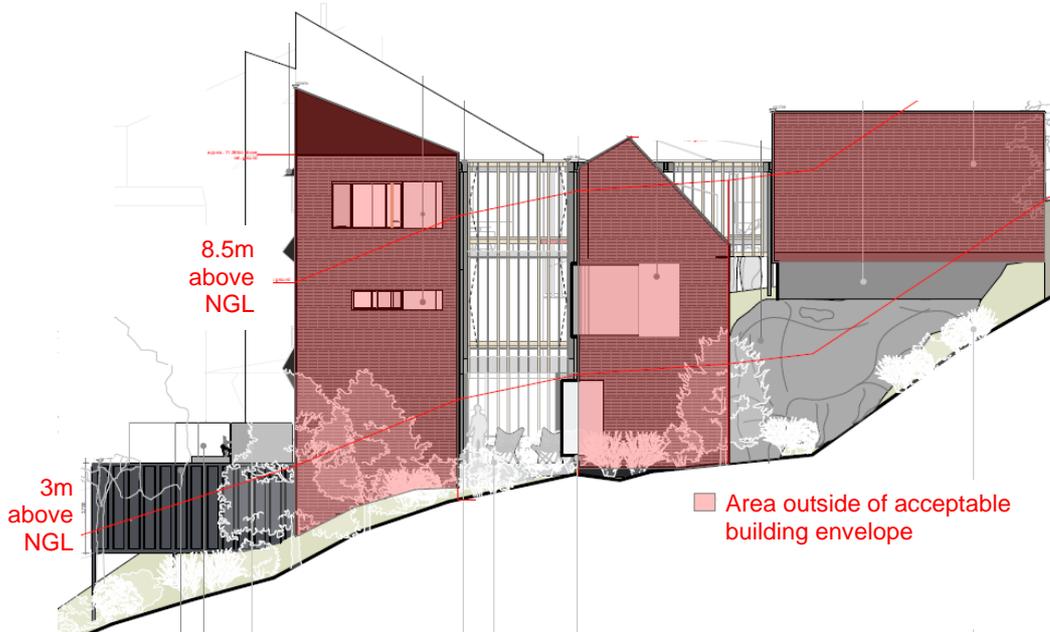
PLANNING BUILDING ENVELOPE ENCHROACHMENT (HIGHLIGHTED RED) WEST ELEVATION
